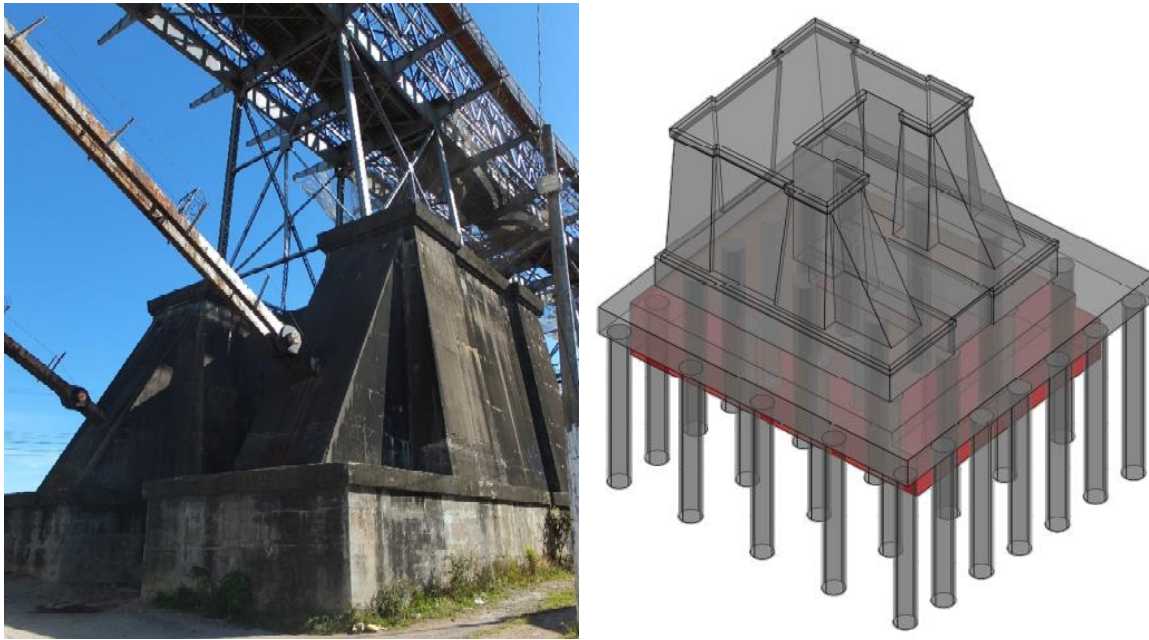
(a) Original continental Anchorage massif - Figure.1 (b) new anchorage massif 3D model
